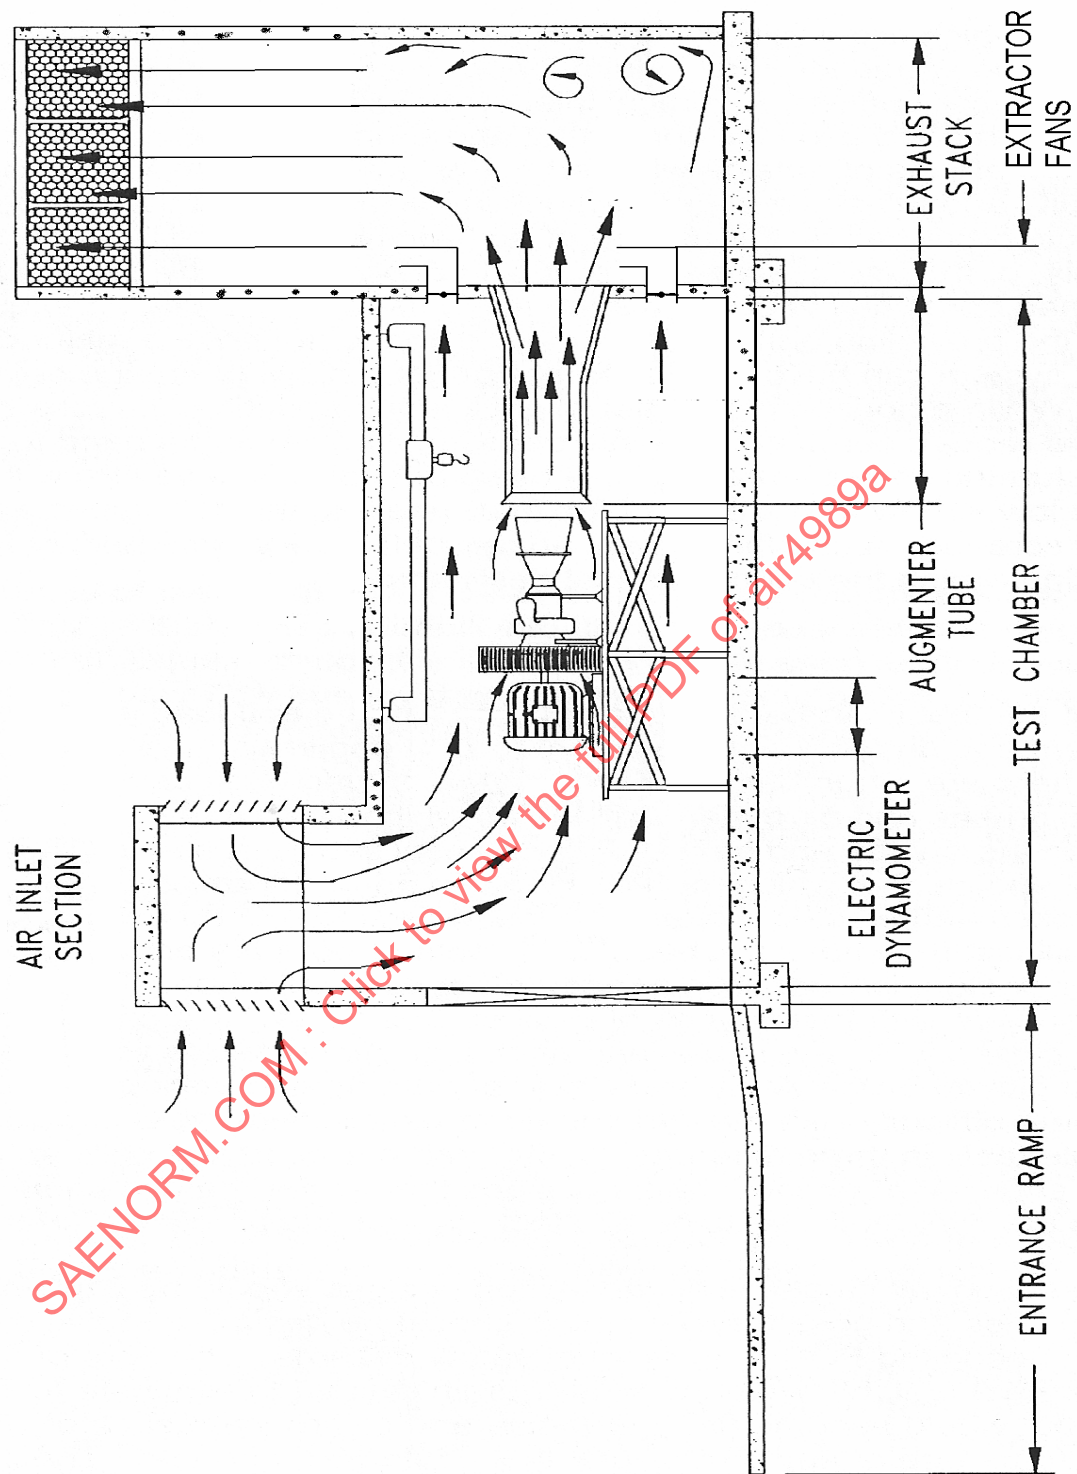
ELECTRIC DYNAMOMETER EQUIPPED TEST CELL
